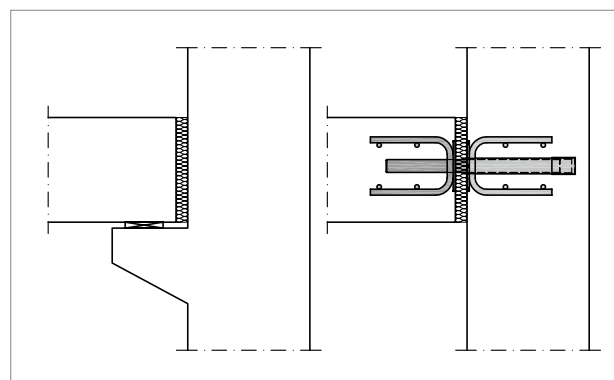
Expansion joint using a Schöck Stacon® instead of a corbel
